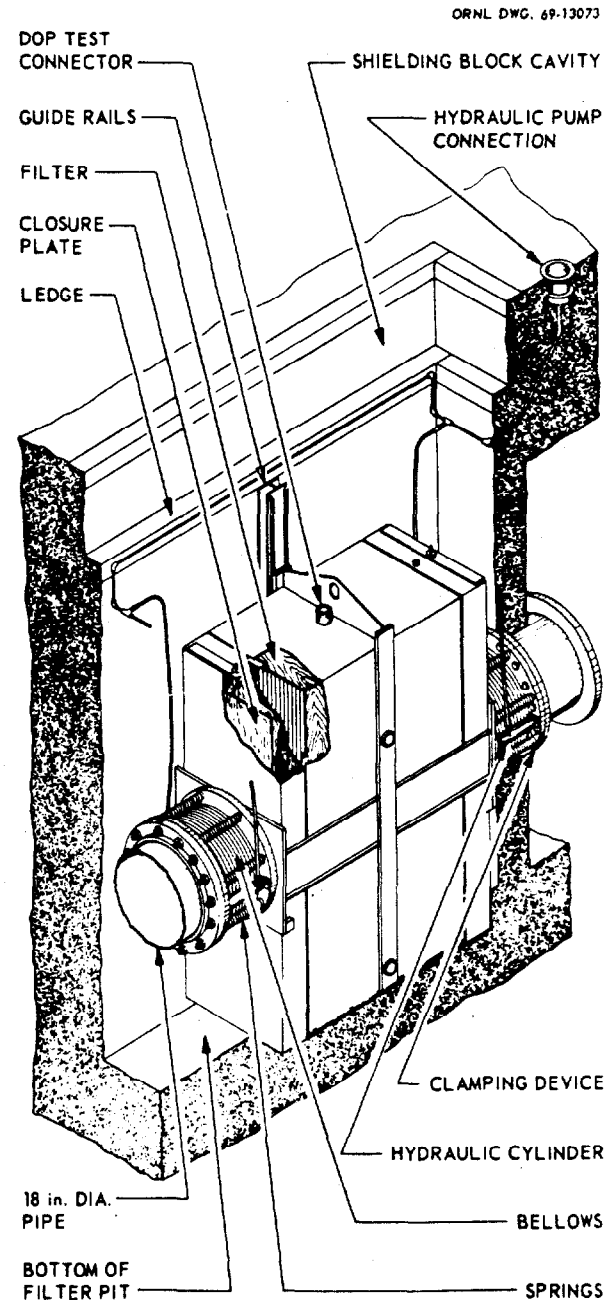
TURF remotely maintainable filter housing, as installed. Filter pit shielding block removed.
